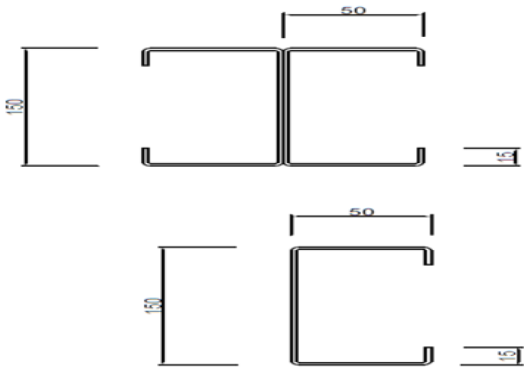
Section geometries- cold-formed steel built-up section C150X50X15 mm
